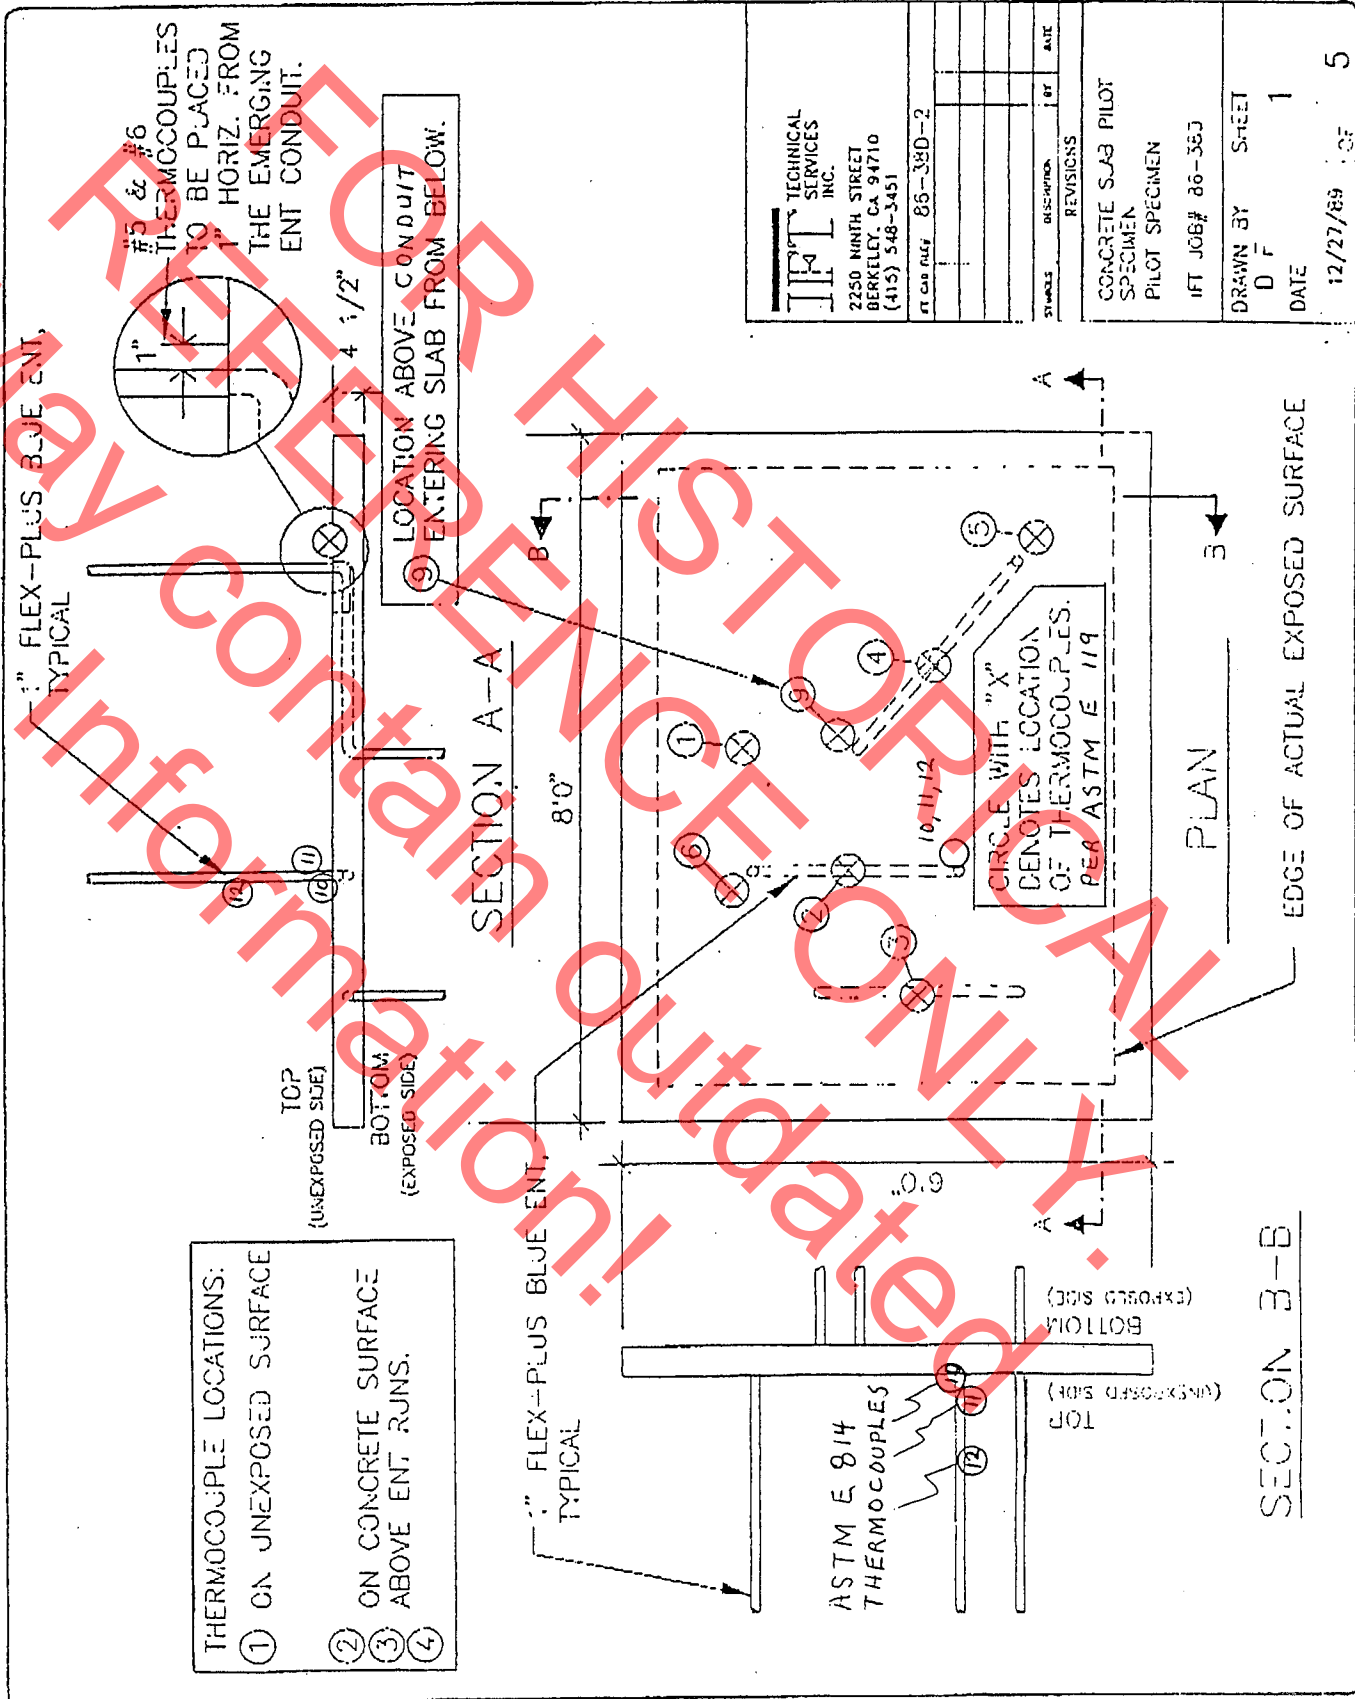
CONDUIT RUN PLACEMENT AND SLAB DIMENSIONS
